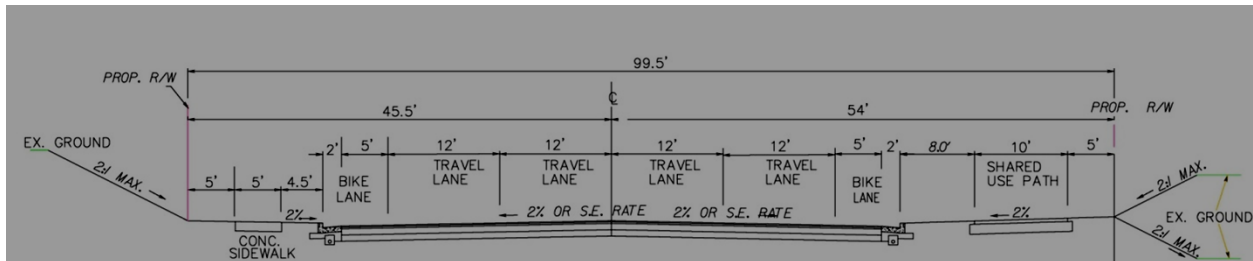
Roadway typical section used in the “Soapstone Connector” feasibility study.
